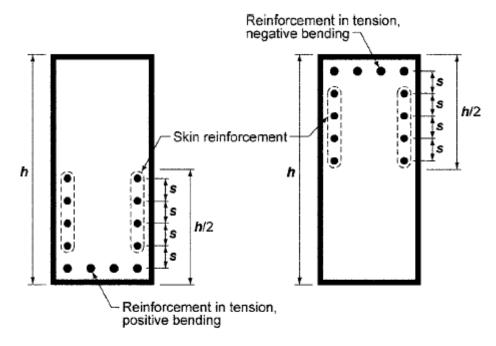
Skin reinforcement for beams and joists with h > 900 mm.
